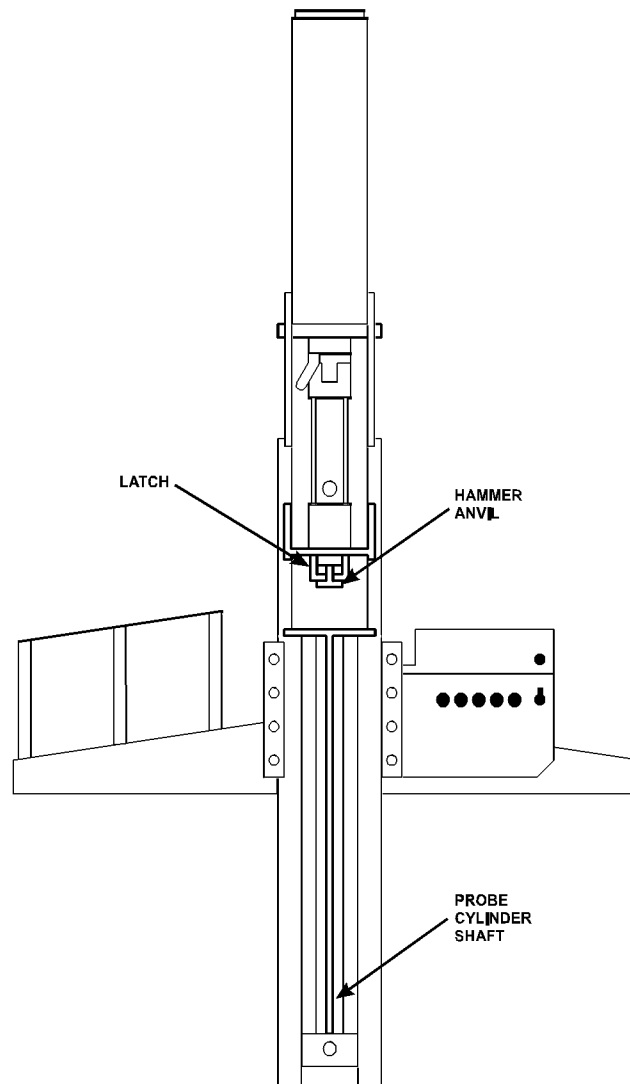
Geoprobe™ Setup for Drilling Through Concrete and Pavement
